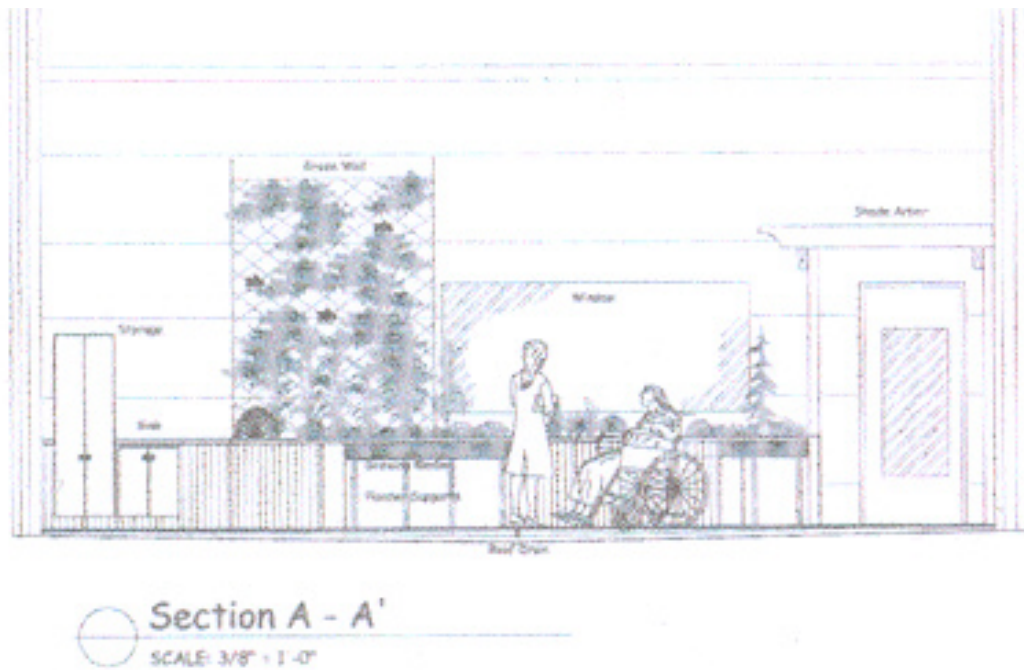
Plant trellises (Green Walls) on cross elevation of back wall (with door).
